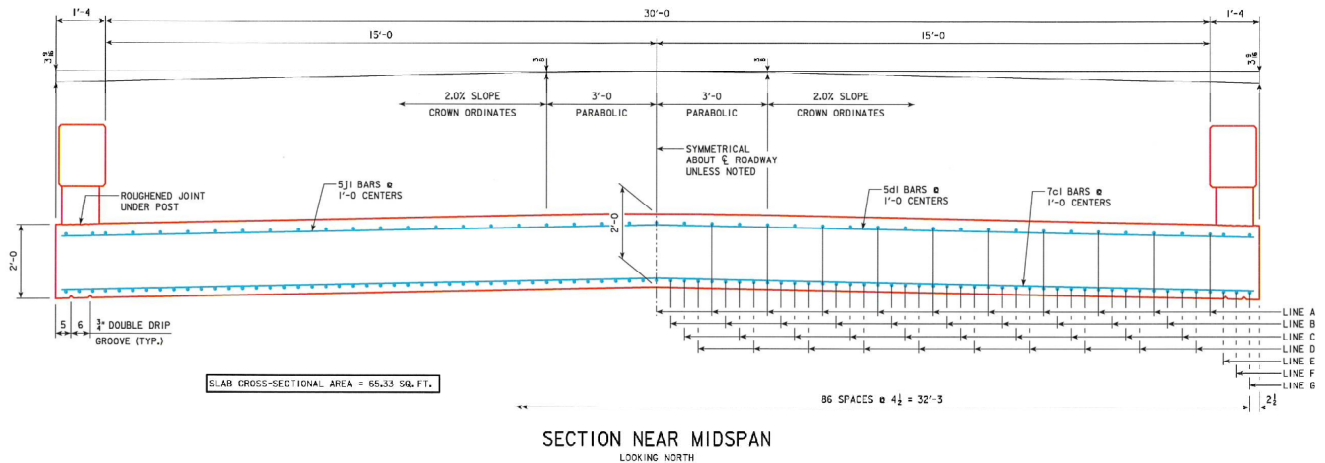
Boone County SSCS bridge transverse section (BROS-SWAP-C008(74)—SE-08)
